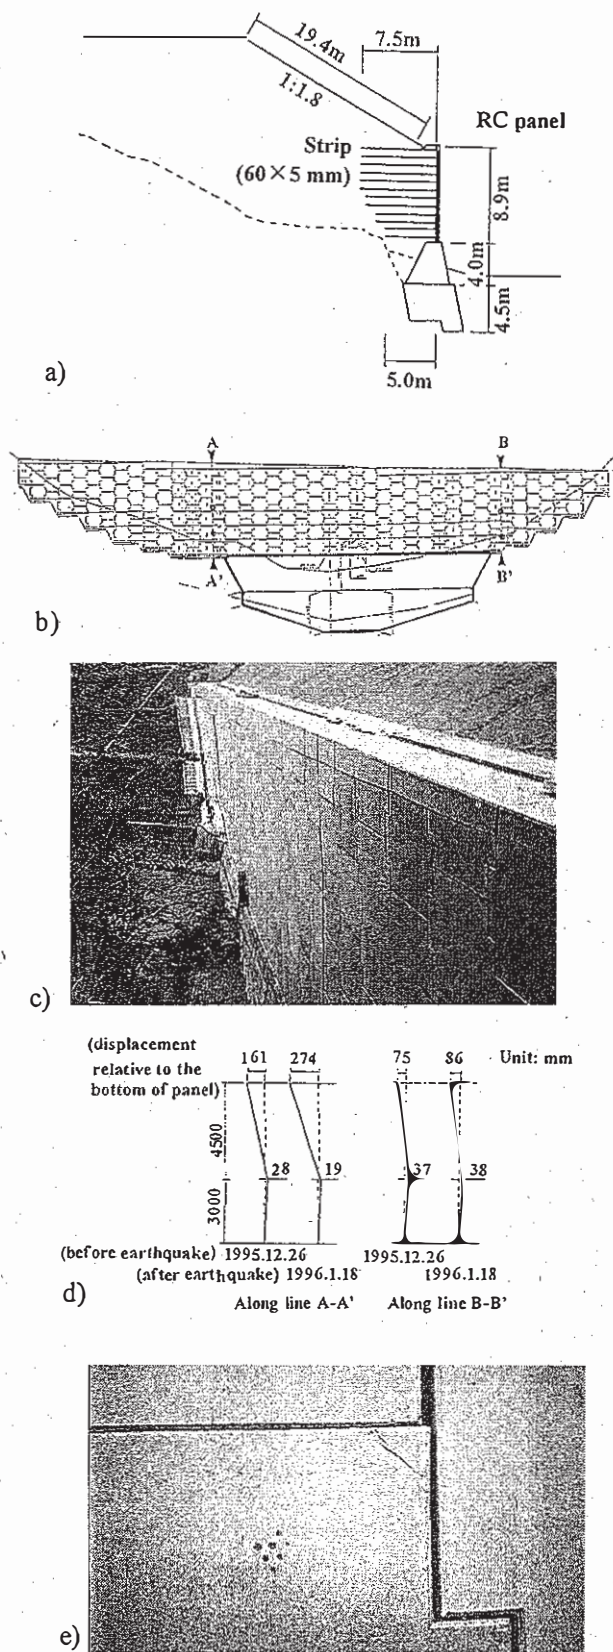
a) Cross-section, b) front view, c) general view, d) wall deformation and e) cracking at the corners of RC panel, Terre Armee wall in Awaji Island (TA1 in Fig. 3) (JTAA, 1995).
